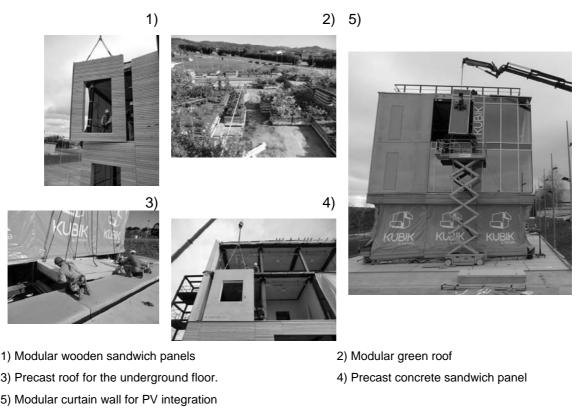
Industrialised systems for facades, building roof and underground floor roof currently under study in KUBIK.
